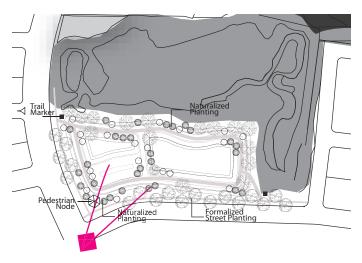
Typical Plan of Embleton Pond with formalized street tree planting and Open Space
